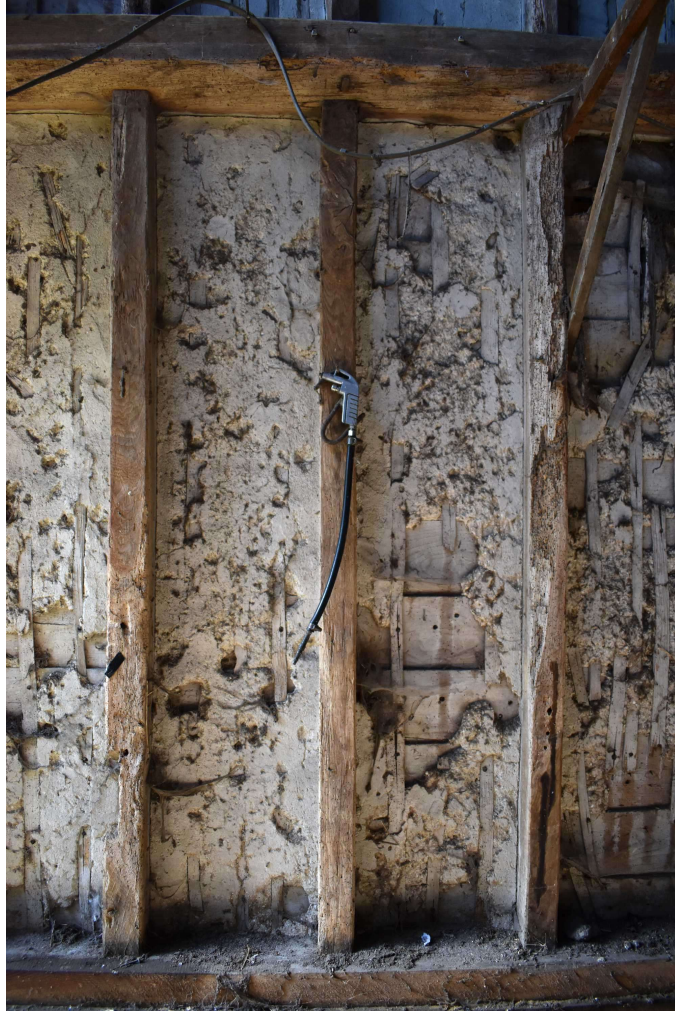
Detail of opening in southern elevation in bay 4. Photograph taken facing south-west.
